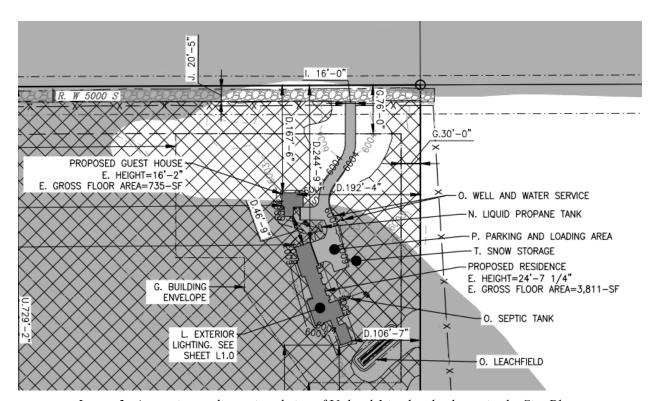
Approximate dimensional size of Upland 1 is clearly shown in the Site Plan.
